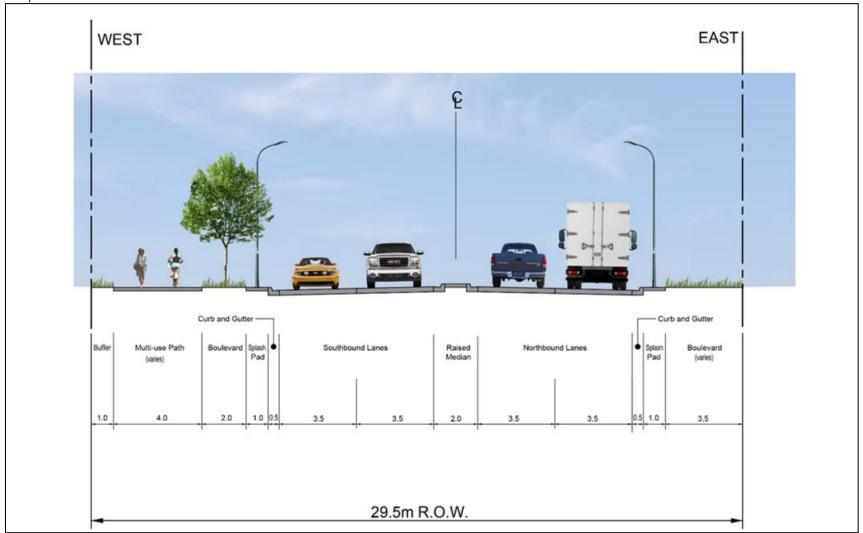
North Section - Cross-Section with Raised Median Through Interchange Between Structures
